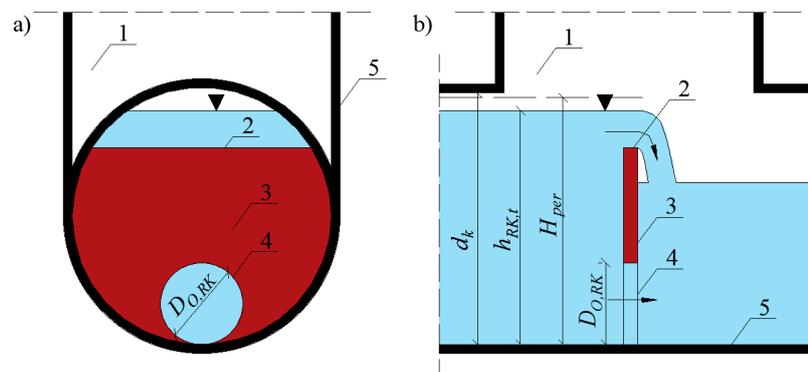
Diagram of the implementation and location of the damming partitions in a manhole: (a) cross-section and (b) longitudinal section. (1—Manhole/sewer chamber, 2—emergency overflow, 3—piling partition, 4—outflow orifice and 5—conduit. H_{per} —Maximum allowable stormwater fill before the piling partition, $h_{RK,t}$ —instantaneous stormwater fill height in the drainage system conduit equipped with a retention system during the time t , d_k —diameter of the conduit and $D_{O,RK}$ —diameter/height of the outflow orifice).
